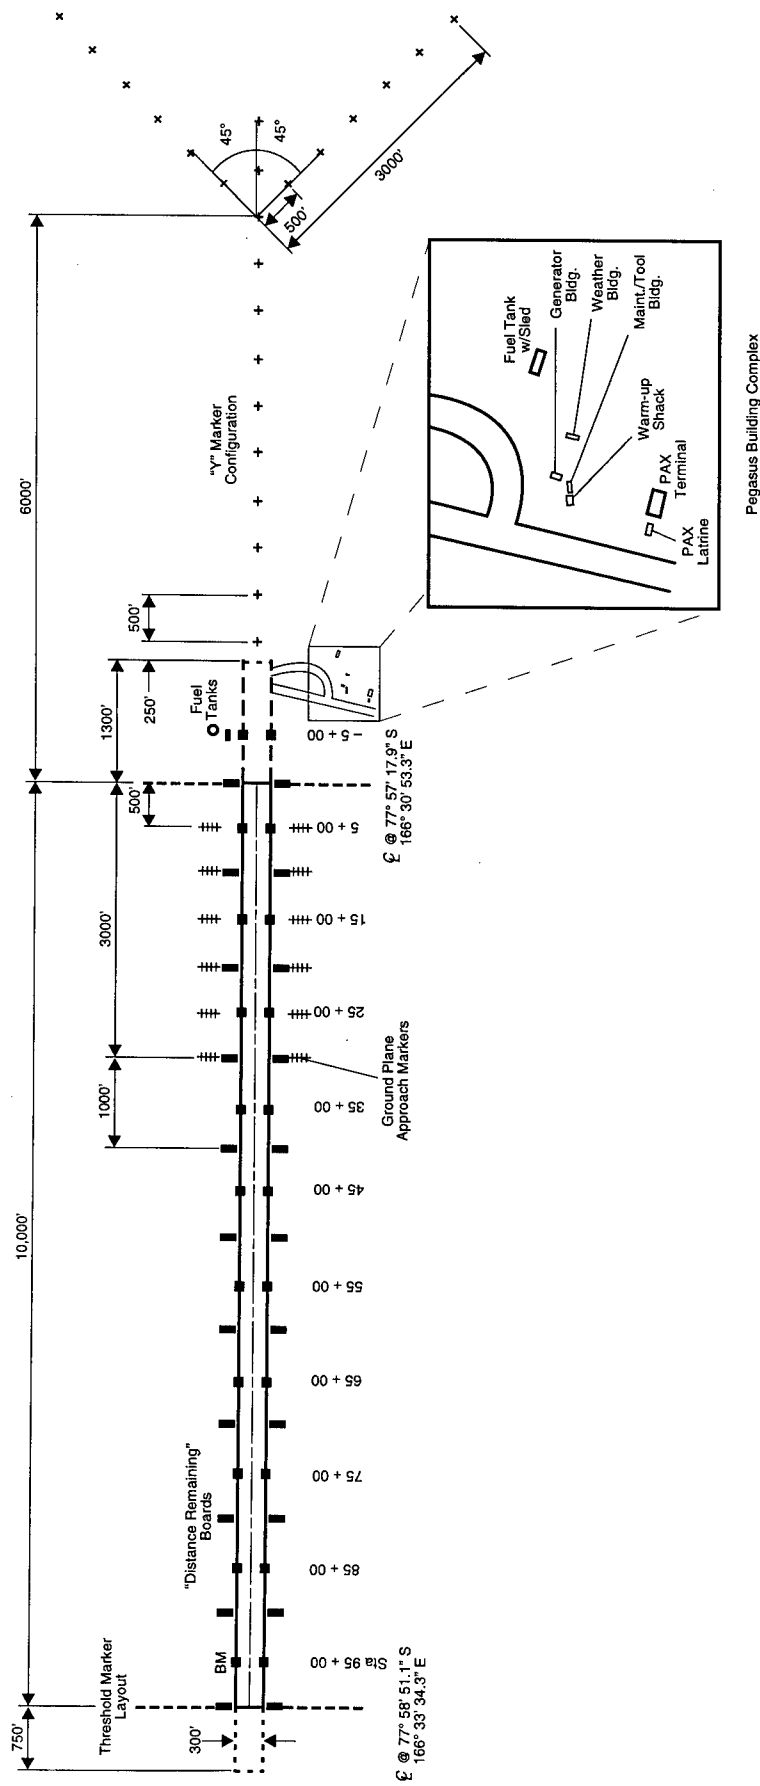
Details of markers for distance remaining, lead in, and ground plane definition.
